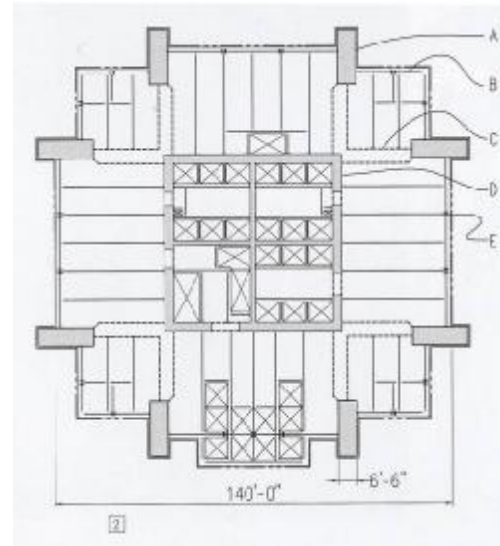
Proposed structural layout for a 2000 foot tower with concrete elements shaded in grey. Note the large exterior “super columns” coupled to the interior core wall [5].
